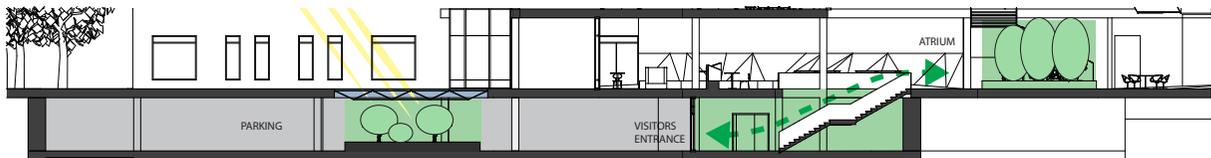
Section through the underground parking illustrating the connection to the ground floor
